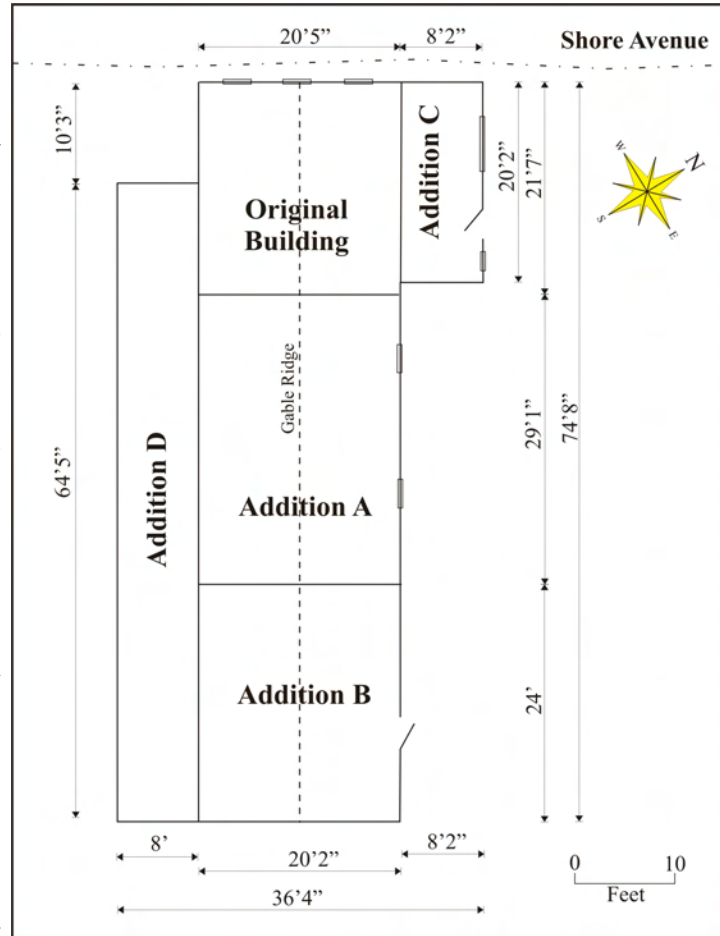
Plan of the Kotzebue Fur Trading Building at 502 Shore Avenue.
